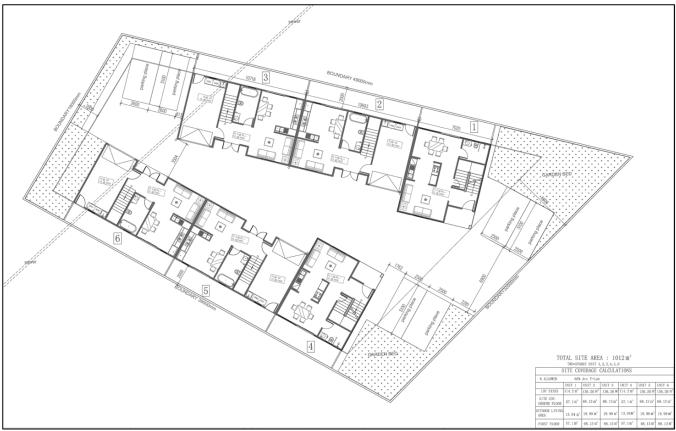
Extract from Site Plan (Prepared by T. Tran)
